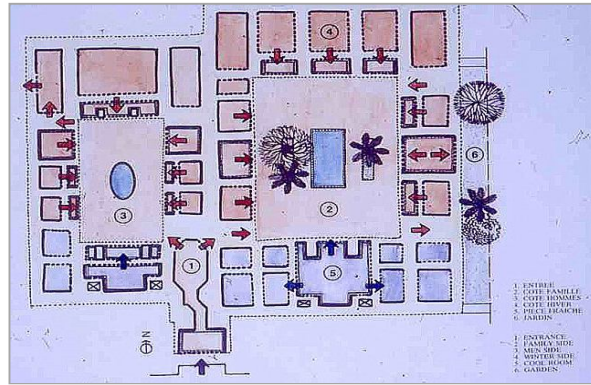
Sample of an Iranian traditional house plan (Rabbat, n.d.).
